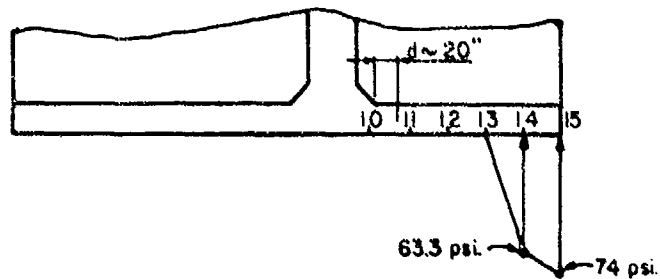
Example C.2: Locations of soil elements on foundation and design loadings.
